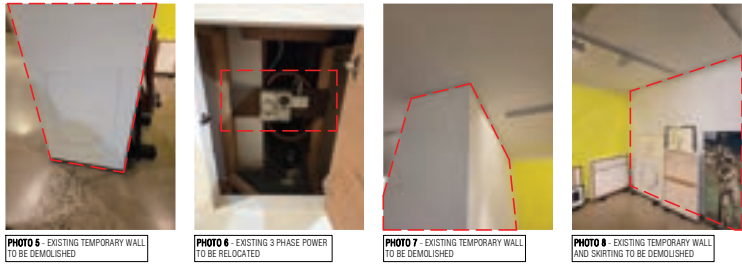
EXISTING TEMPORARY WALL TO BE DEMOLISHED
